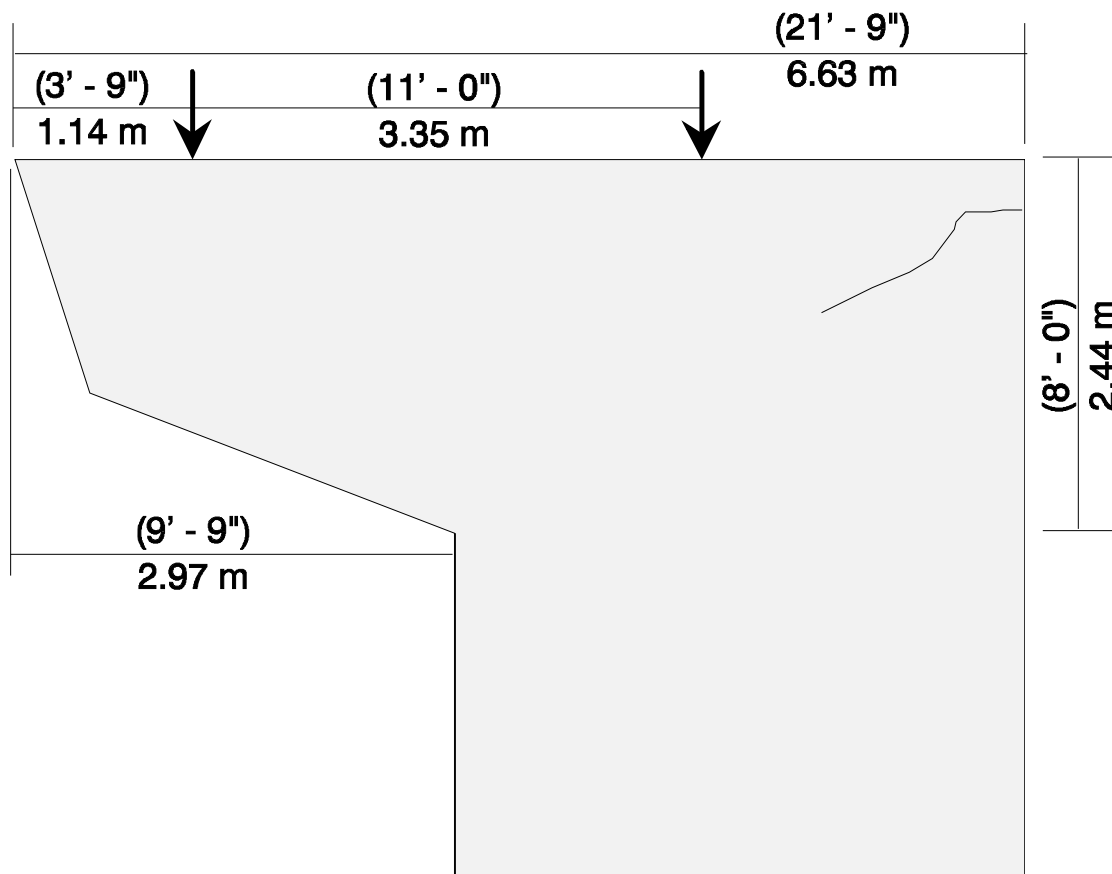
Pattern of Cracks in Pier D-38C
